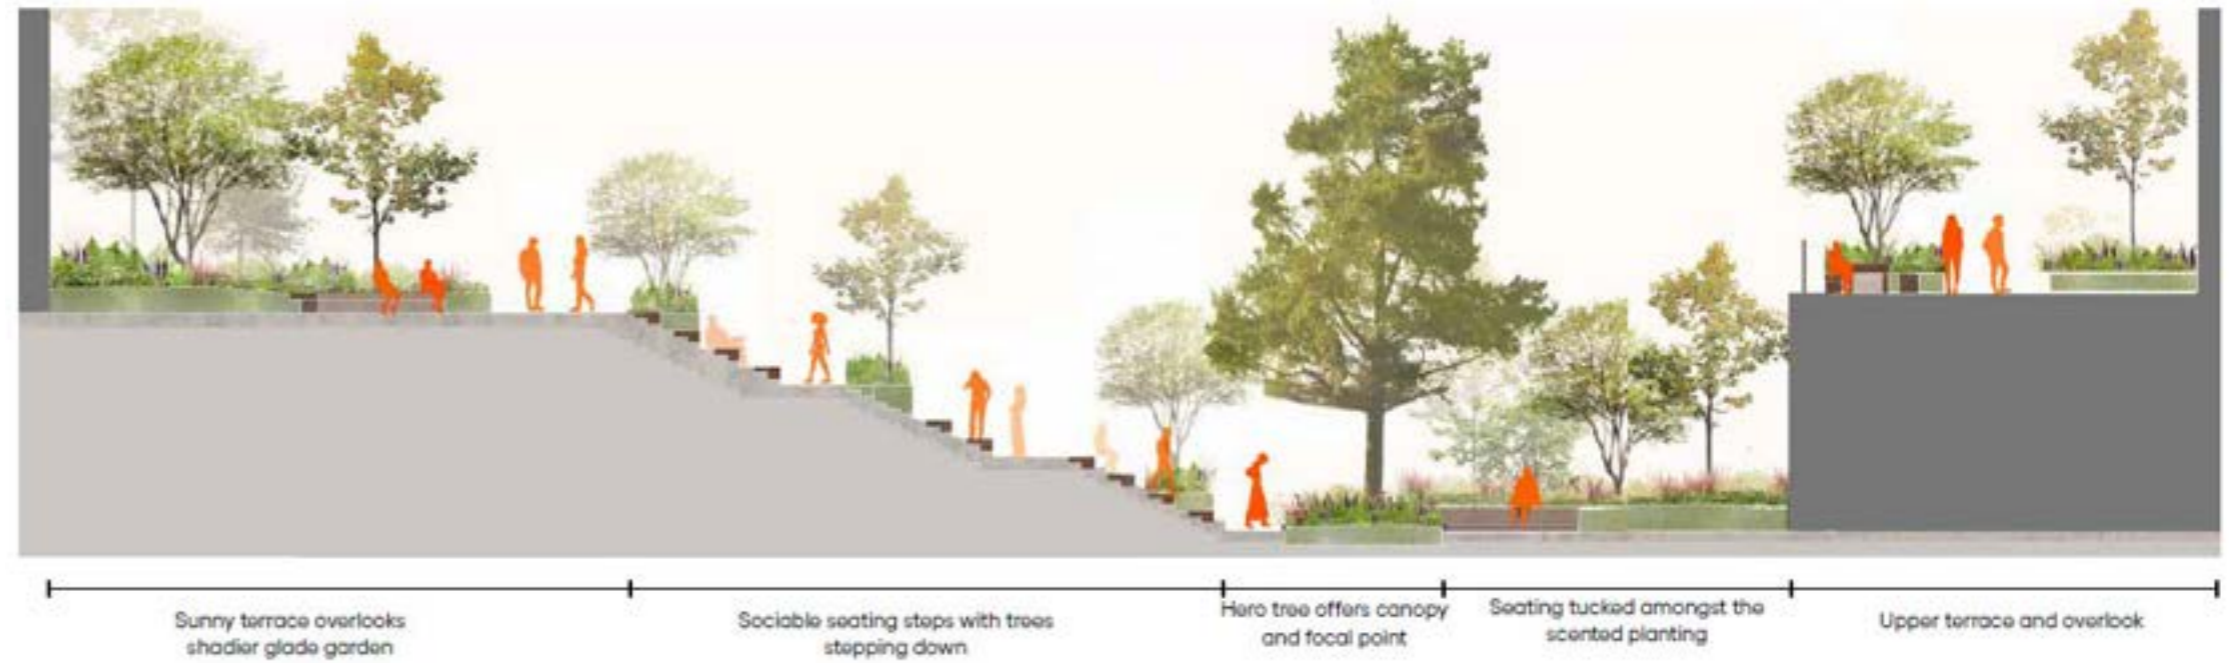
Section through the proposed garden courtyard for residents (Source: Churchman Thornhill Finch)
